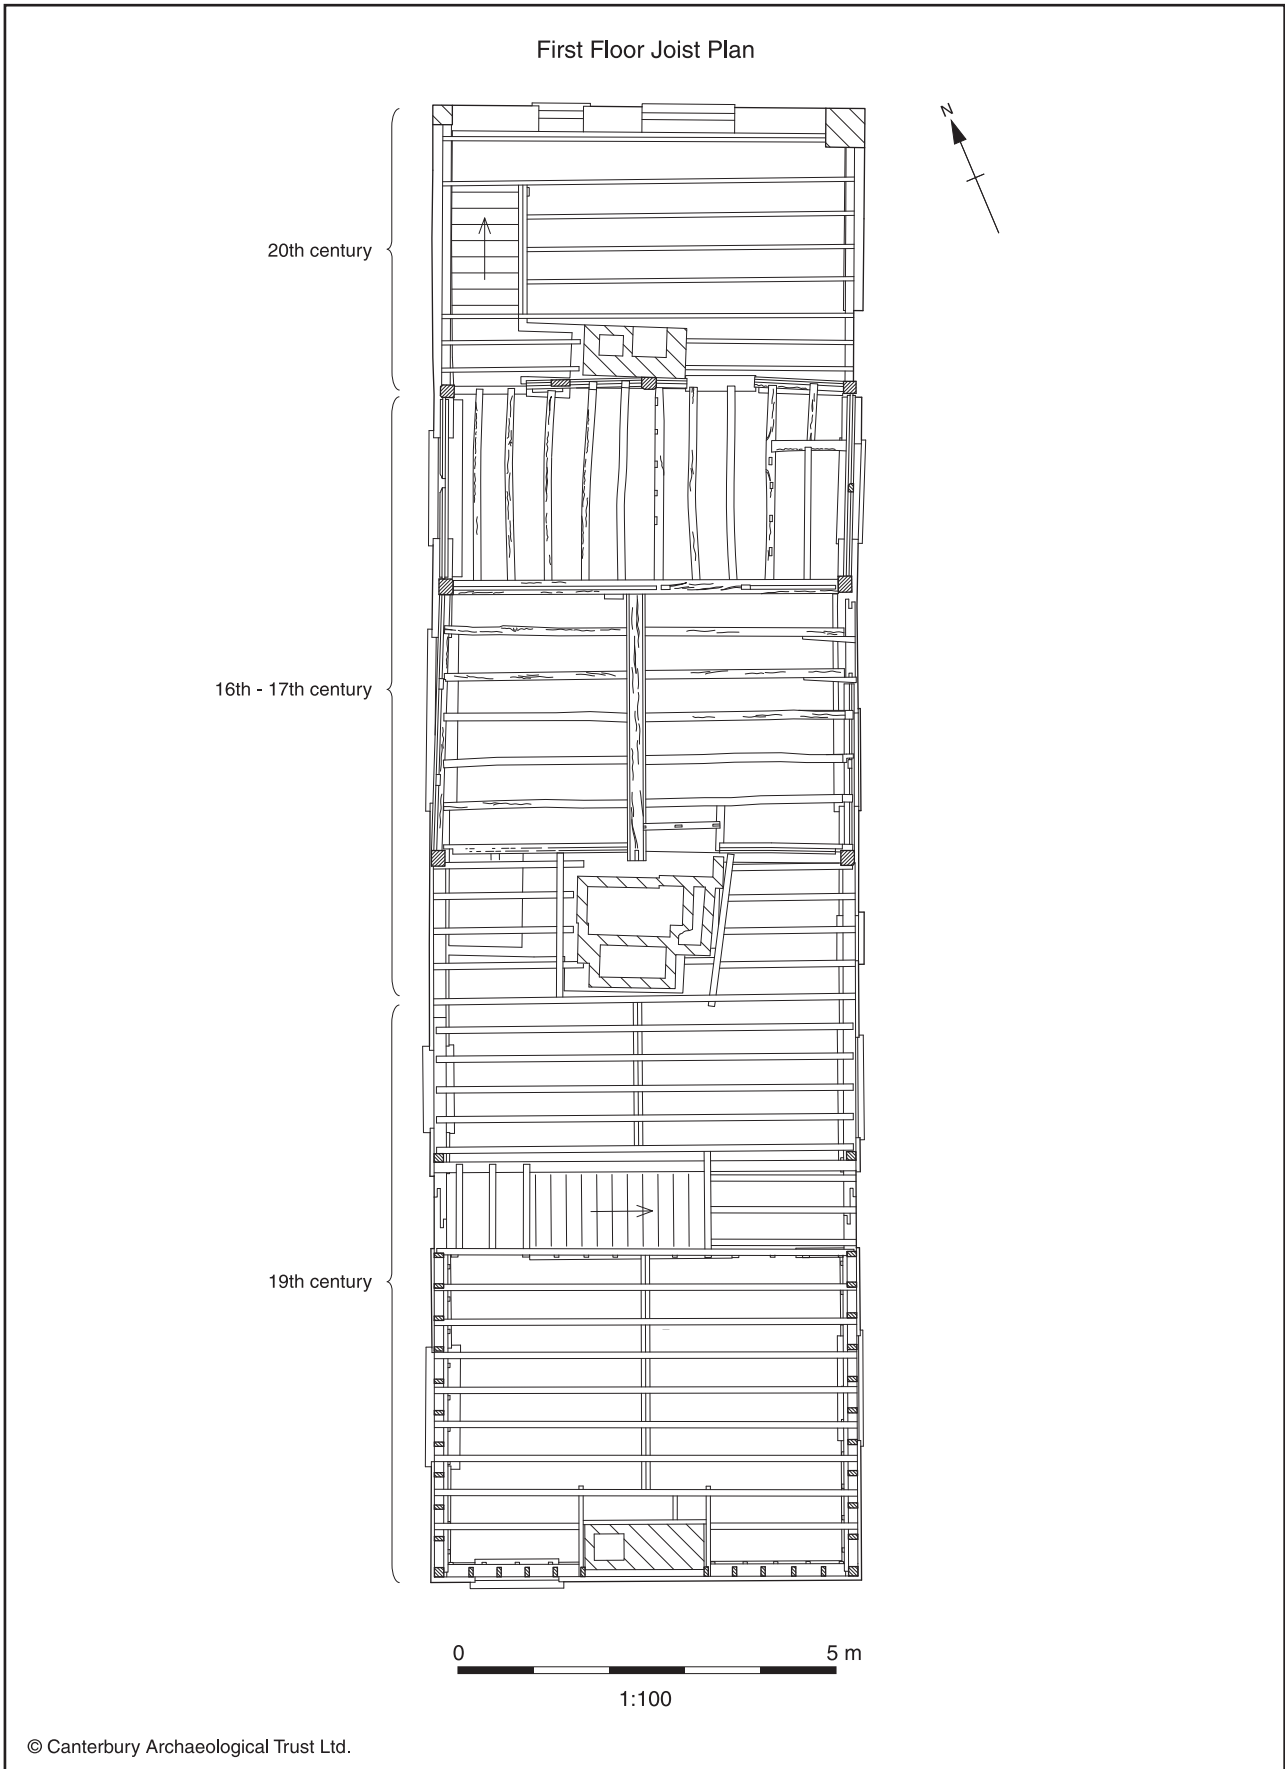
Old and Water Street Cottages: first floor joist plan
